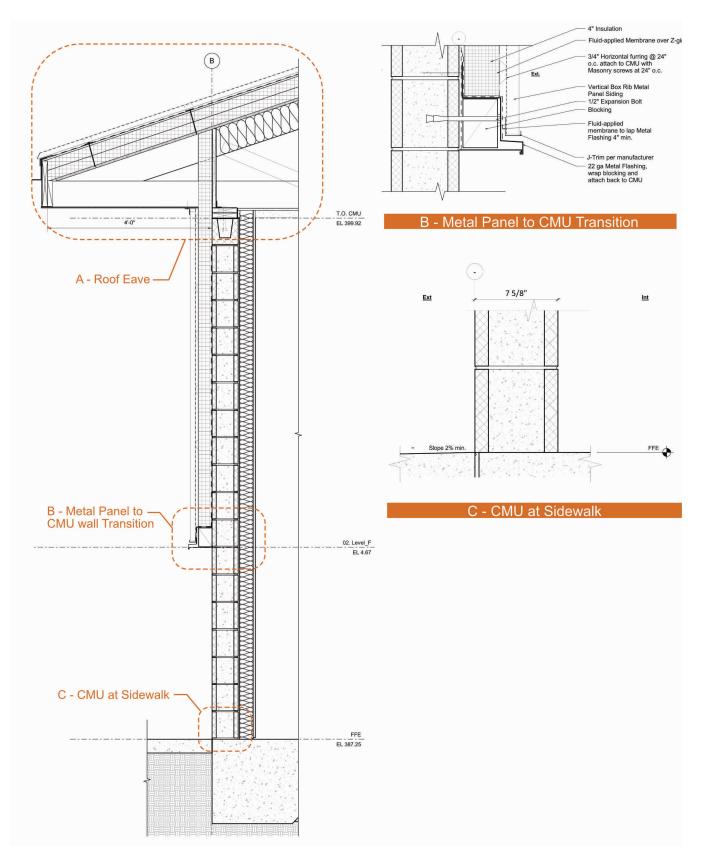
UNOCCUPIED BUILDING WALL SECTION AND DETAILS
